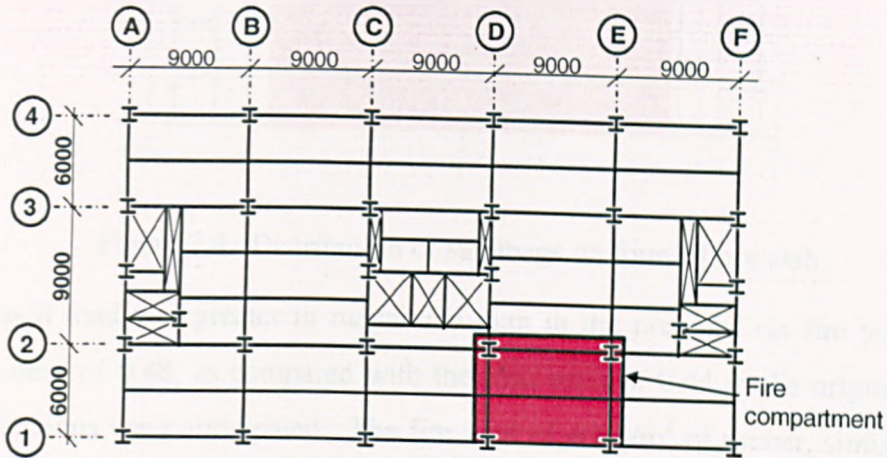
Floor plan and location of fire “Test 7” compartment.
